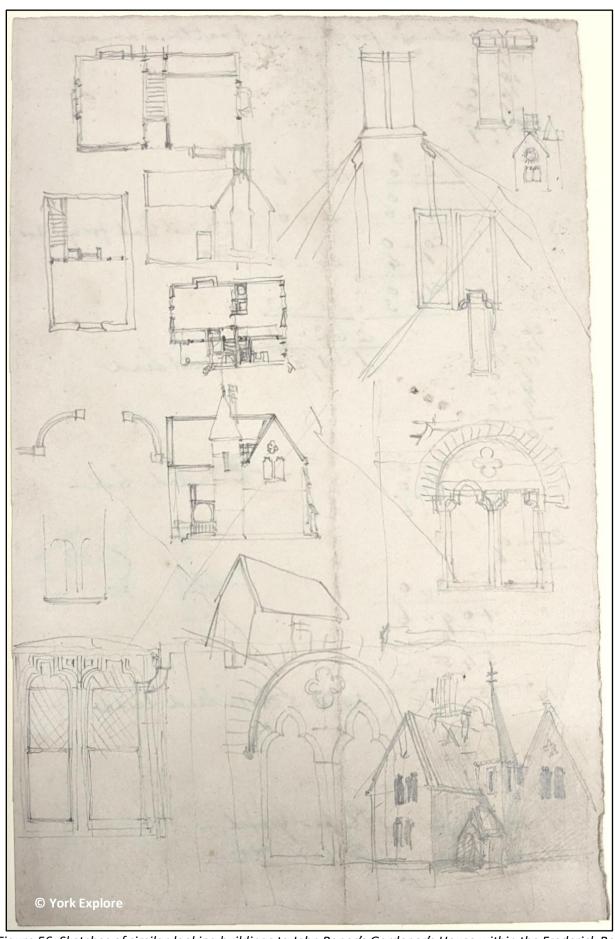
Sketches of similar-looking buildings to John Roper's Gardener's House within the Frederick Bell collection (CYA FBE/1/116).
